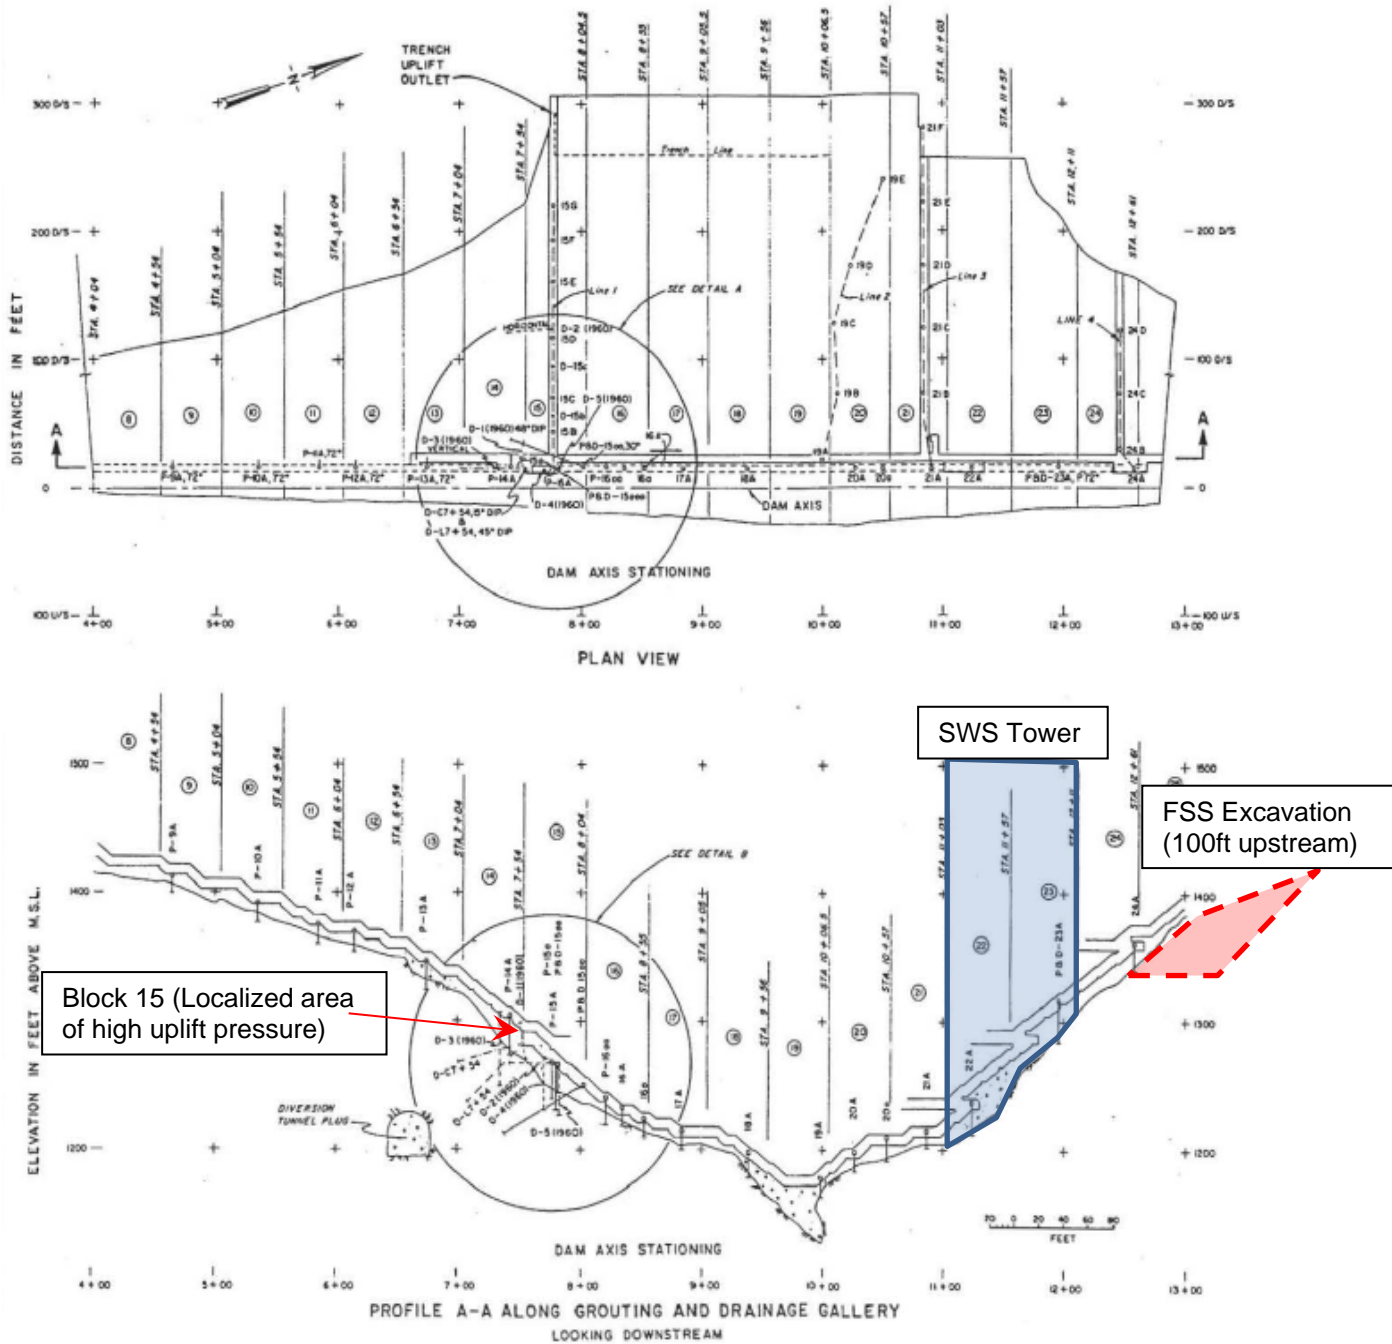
Permanent Dam Safety and Temporary Construction Instrumentation
